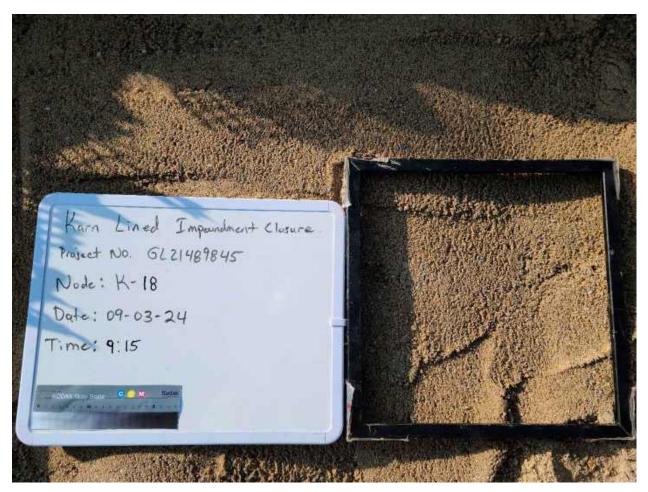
Typical photo documentation from the non-concrete-lined portion of the Settling Basin.
